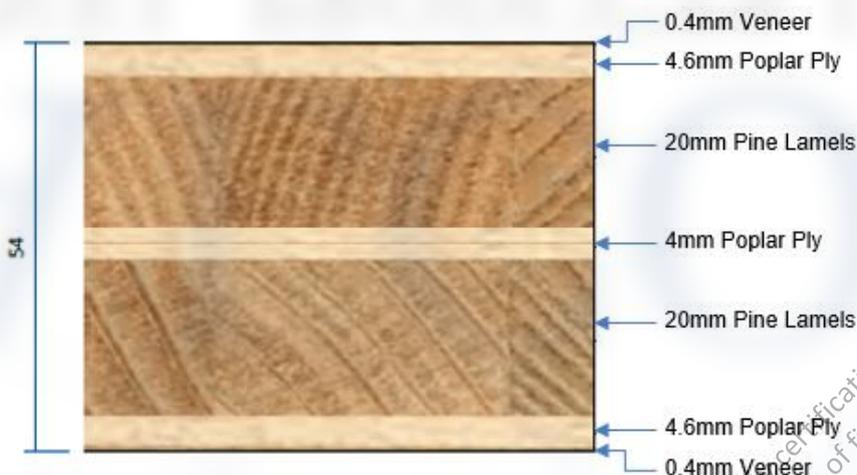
Leaf 1 (Type 2) Stredor 54 with plywood facing
